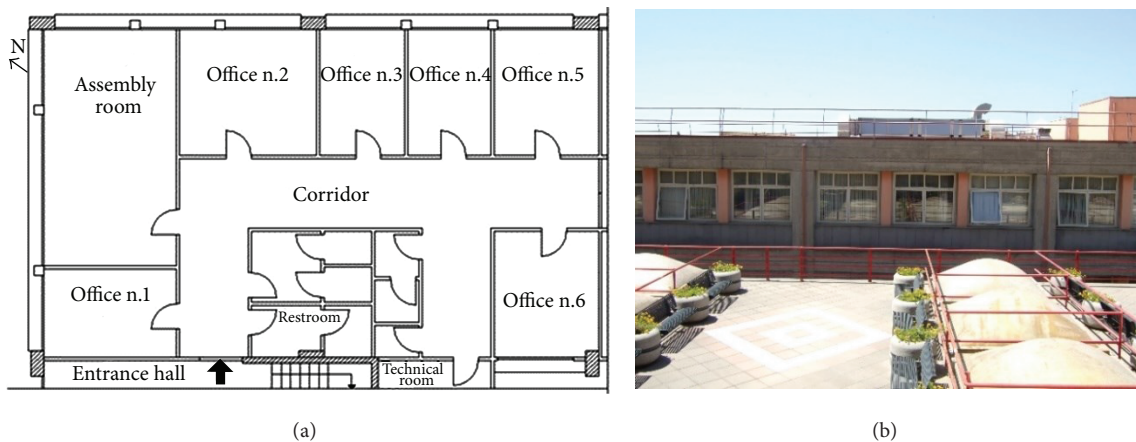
Ground plan with building orientation and picture of the main façade.
